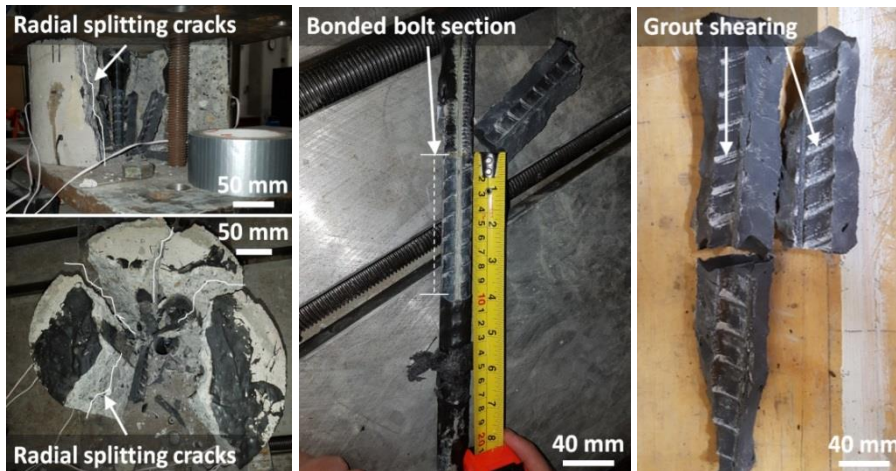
Specimen *i* post testing analysis Left; Radial splitting of concrete cylinder and grout. Center; Bonded section of rebar. Right; Intact grout
